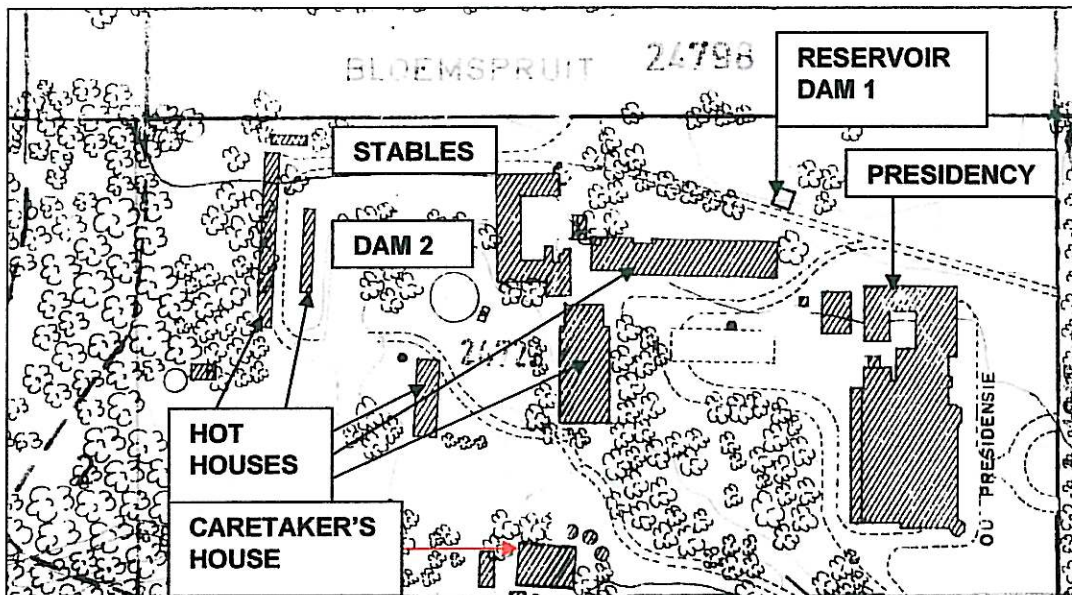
Plan drawing of the site dating from 1898 (Bloemfontein Townplanning Department).
